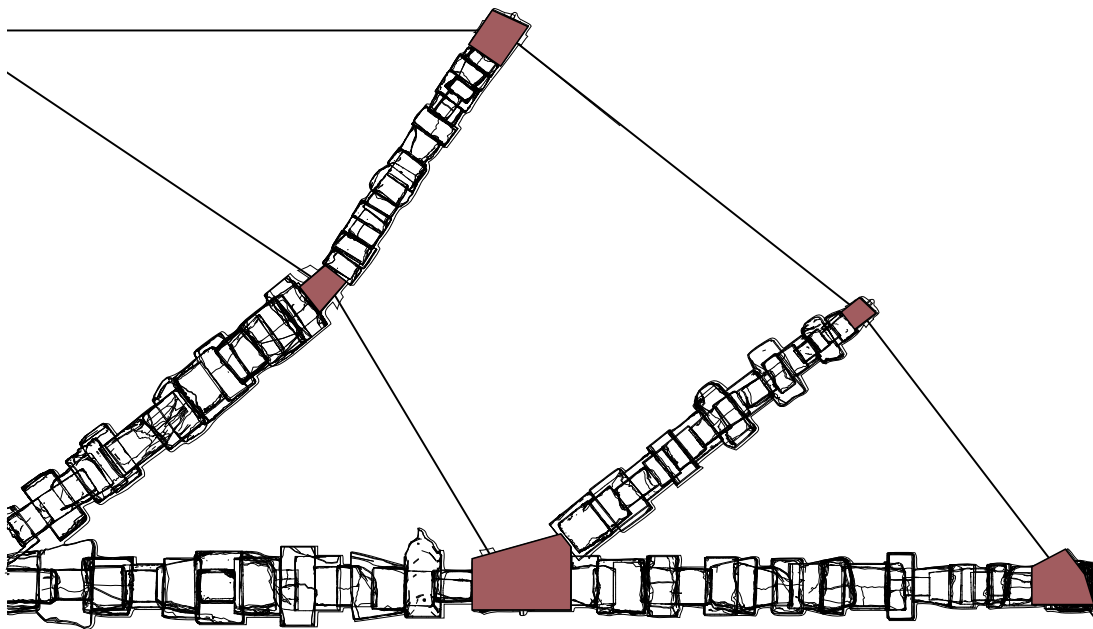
Drawing of intended Pier Structure Topology with 'Orienting Joints'
